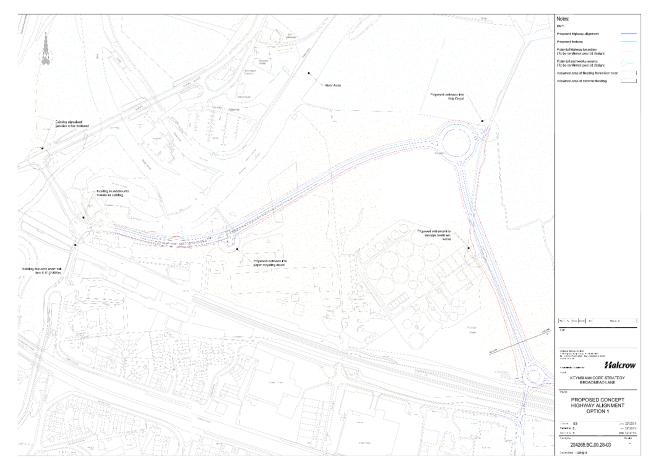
Proposed Link Road (or Haul Road) from A4175 to Broadmead Lane Bridge construction area
